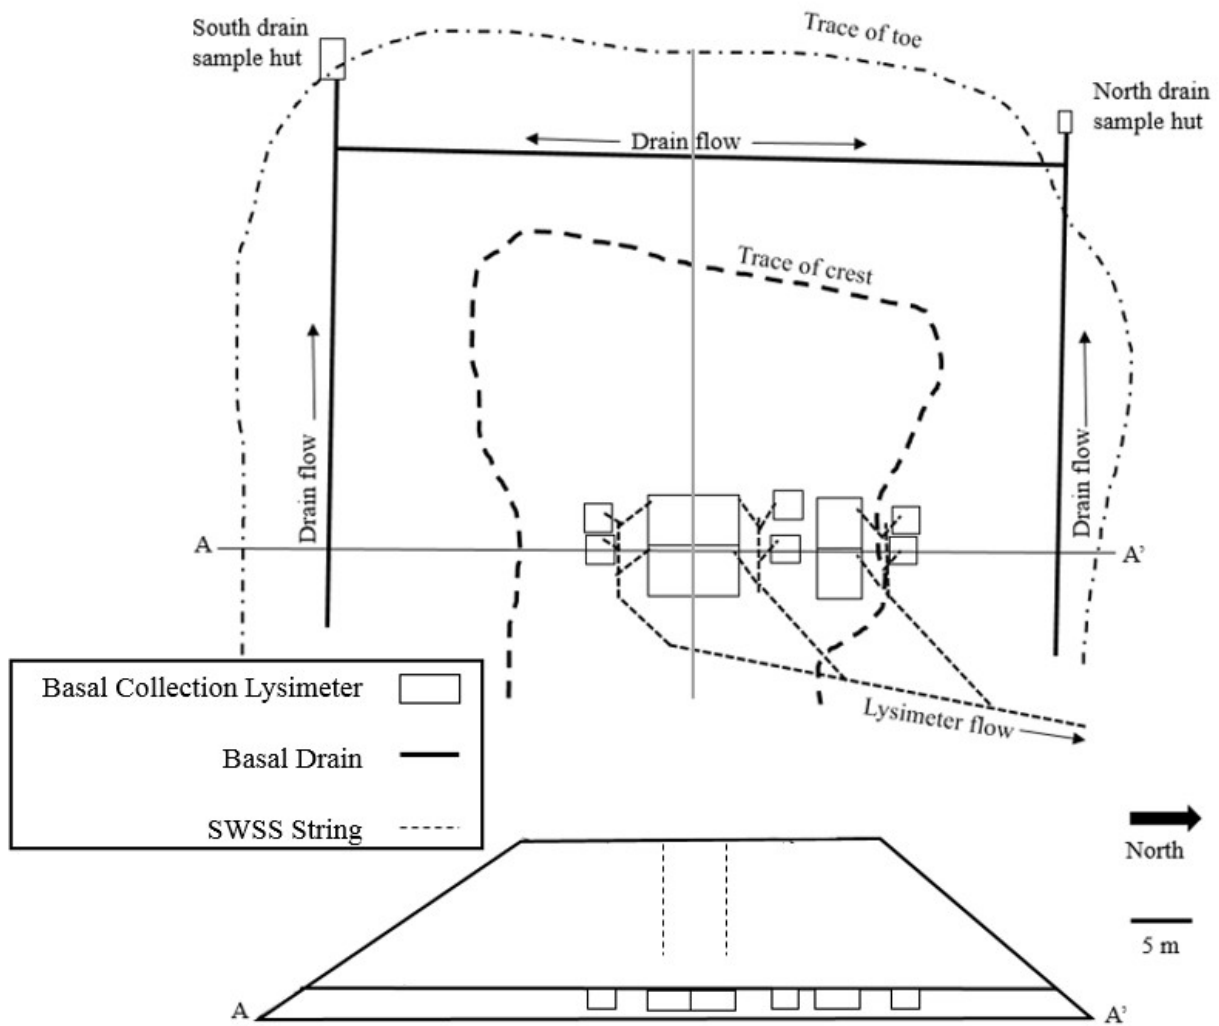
General schematic of the Type III test pile, showing locations of relevant instrumentation (Sinclair et al., 2015).
